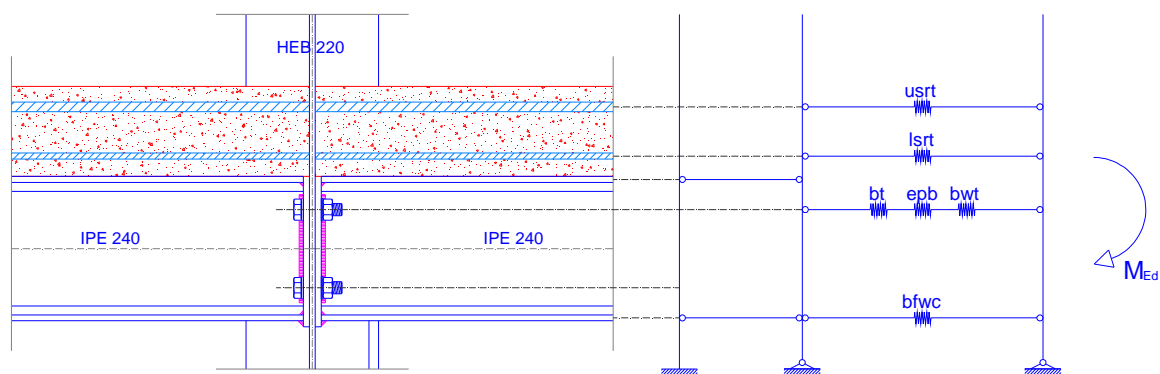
Double Side Beam-to-Column Joint connected on column web (Type 5 and 6)
